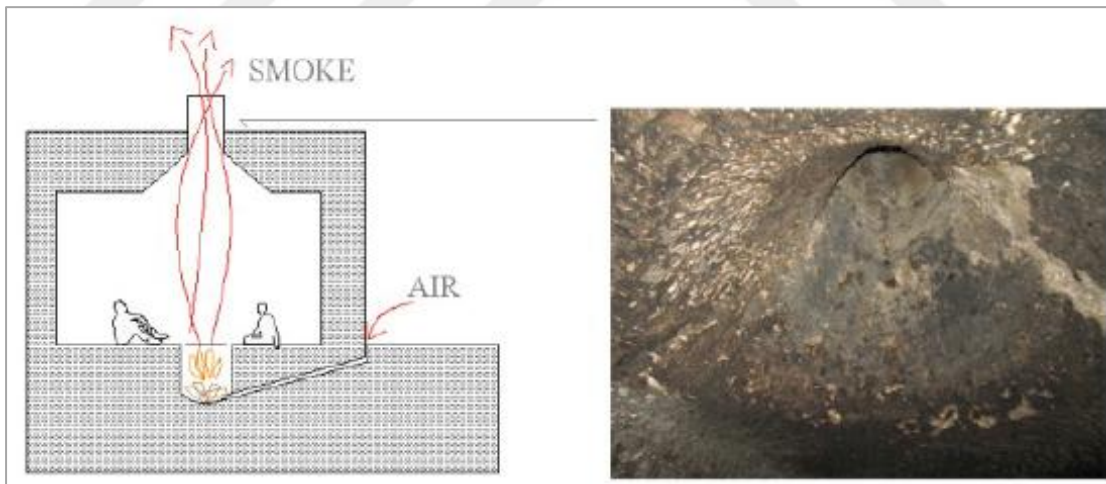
Chimney detail of rock-cut building in Cappadocia-Turkey
